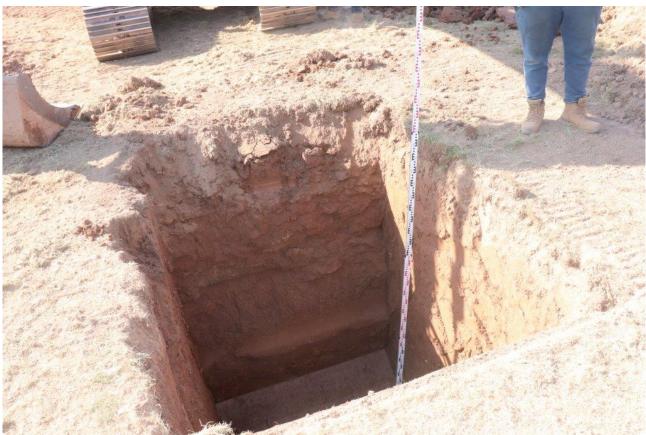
Test Pit 1 excavated to full depth of 3.00m showing sterile homogenous alluvial deposits above sand and gravel river terrace at base, measuring staff as scale, view south-west
